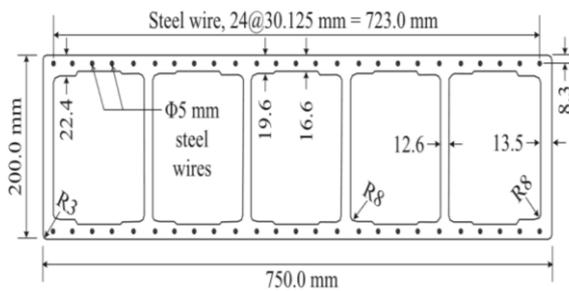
Cross-sectional profile of steel reinforced GFRP deck panel
